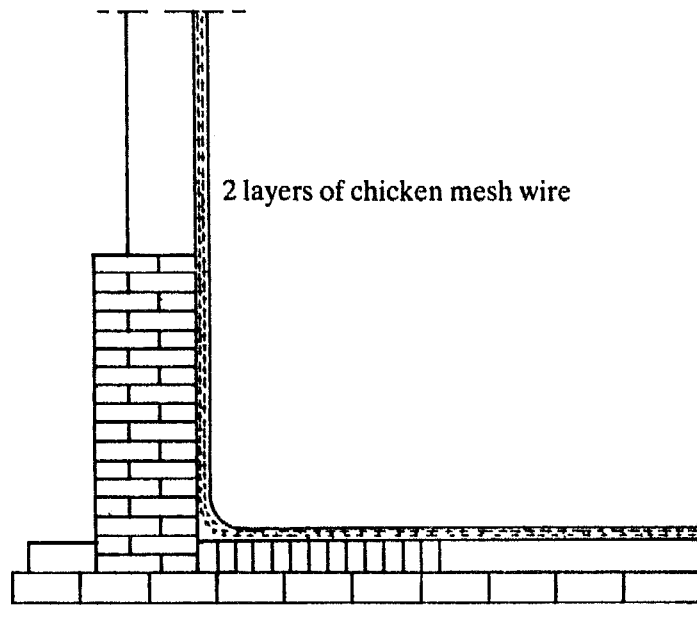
Cross-section of filter wall constructed of masonry and ferrocement
